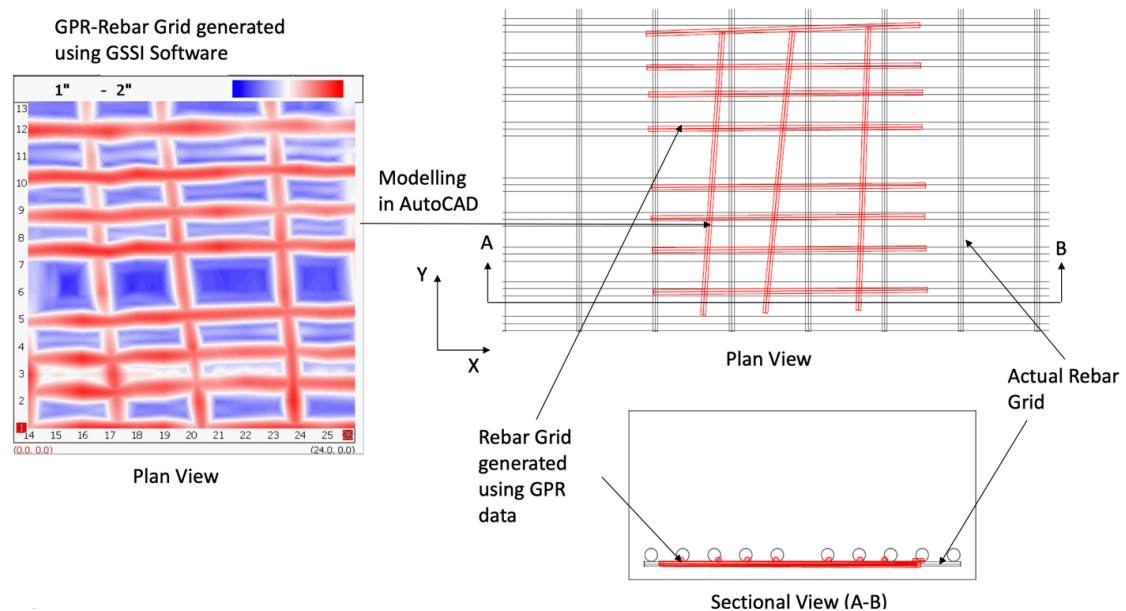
Rebar Grid generated using GPR data (RC Bridge Deck Slab at Site SI-3006A)
